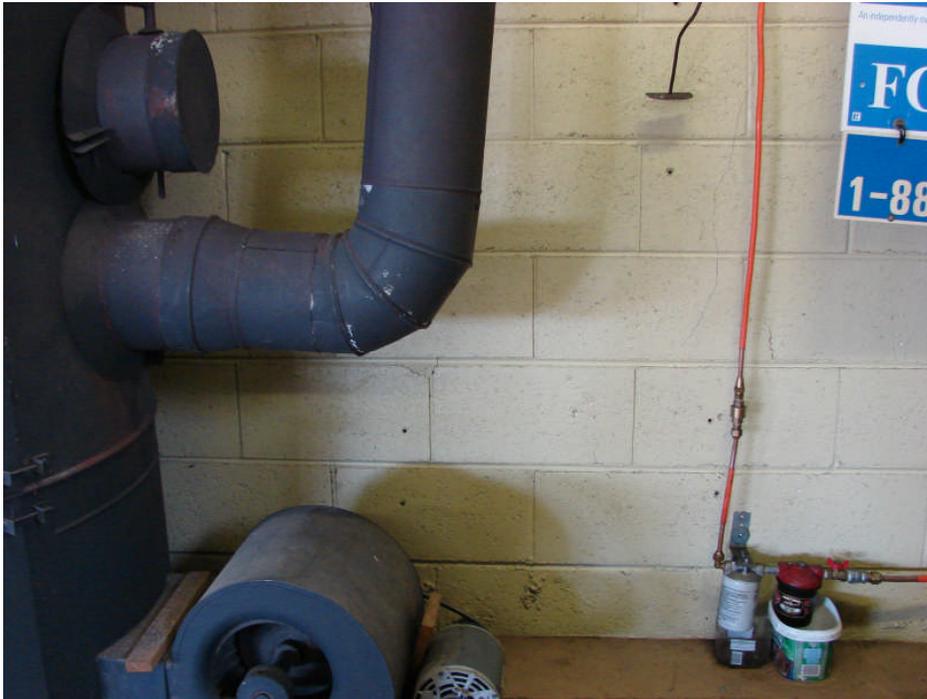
Garage Building north wall – continued wall and slab cracks at east concrete block pier, typical.
